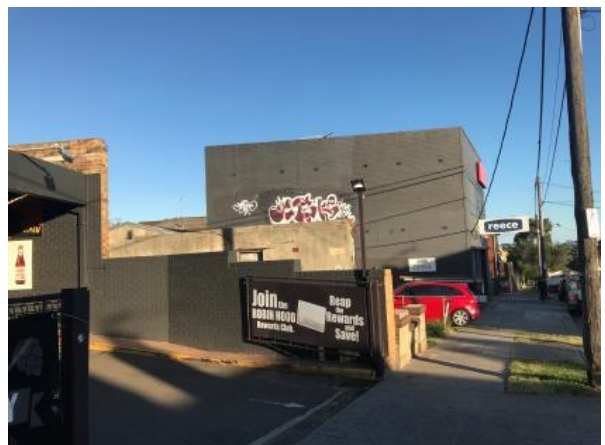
Existing brick warehouse building (Reece Plumbing) located south of the site on Carrington Road
